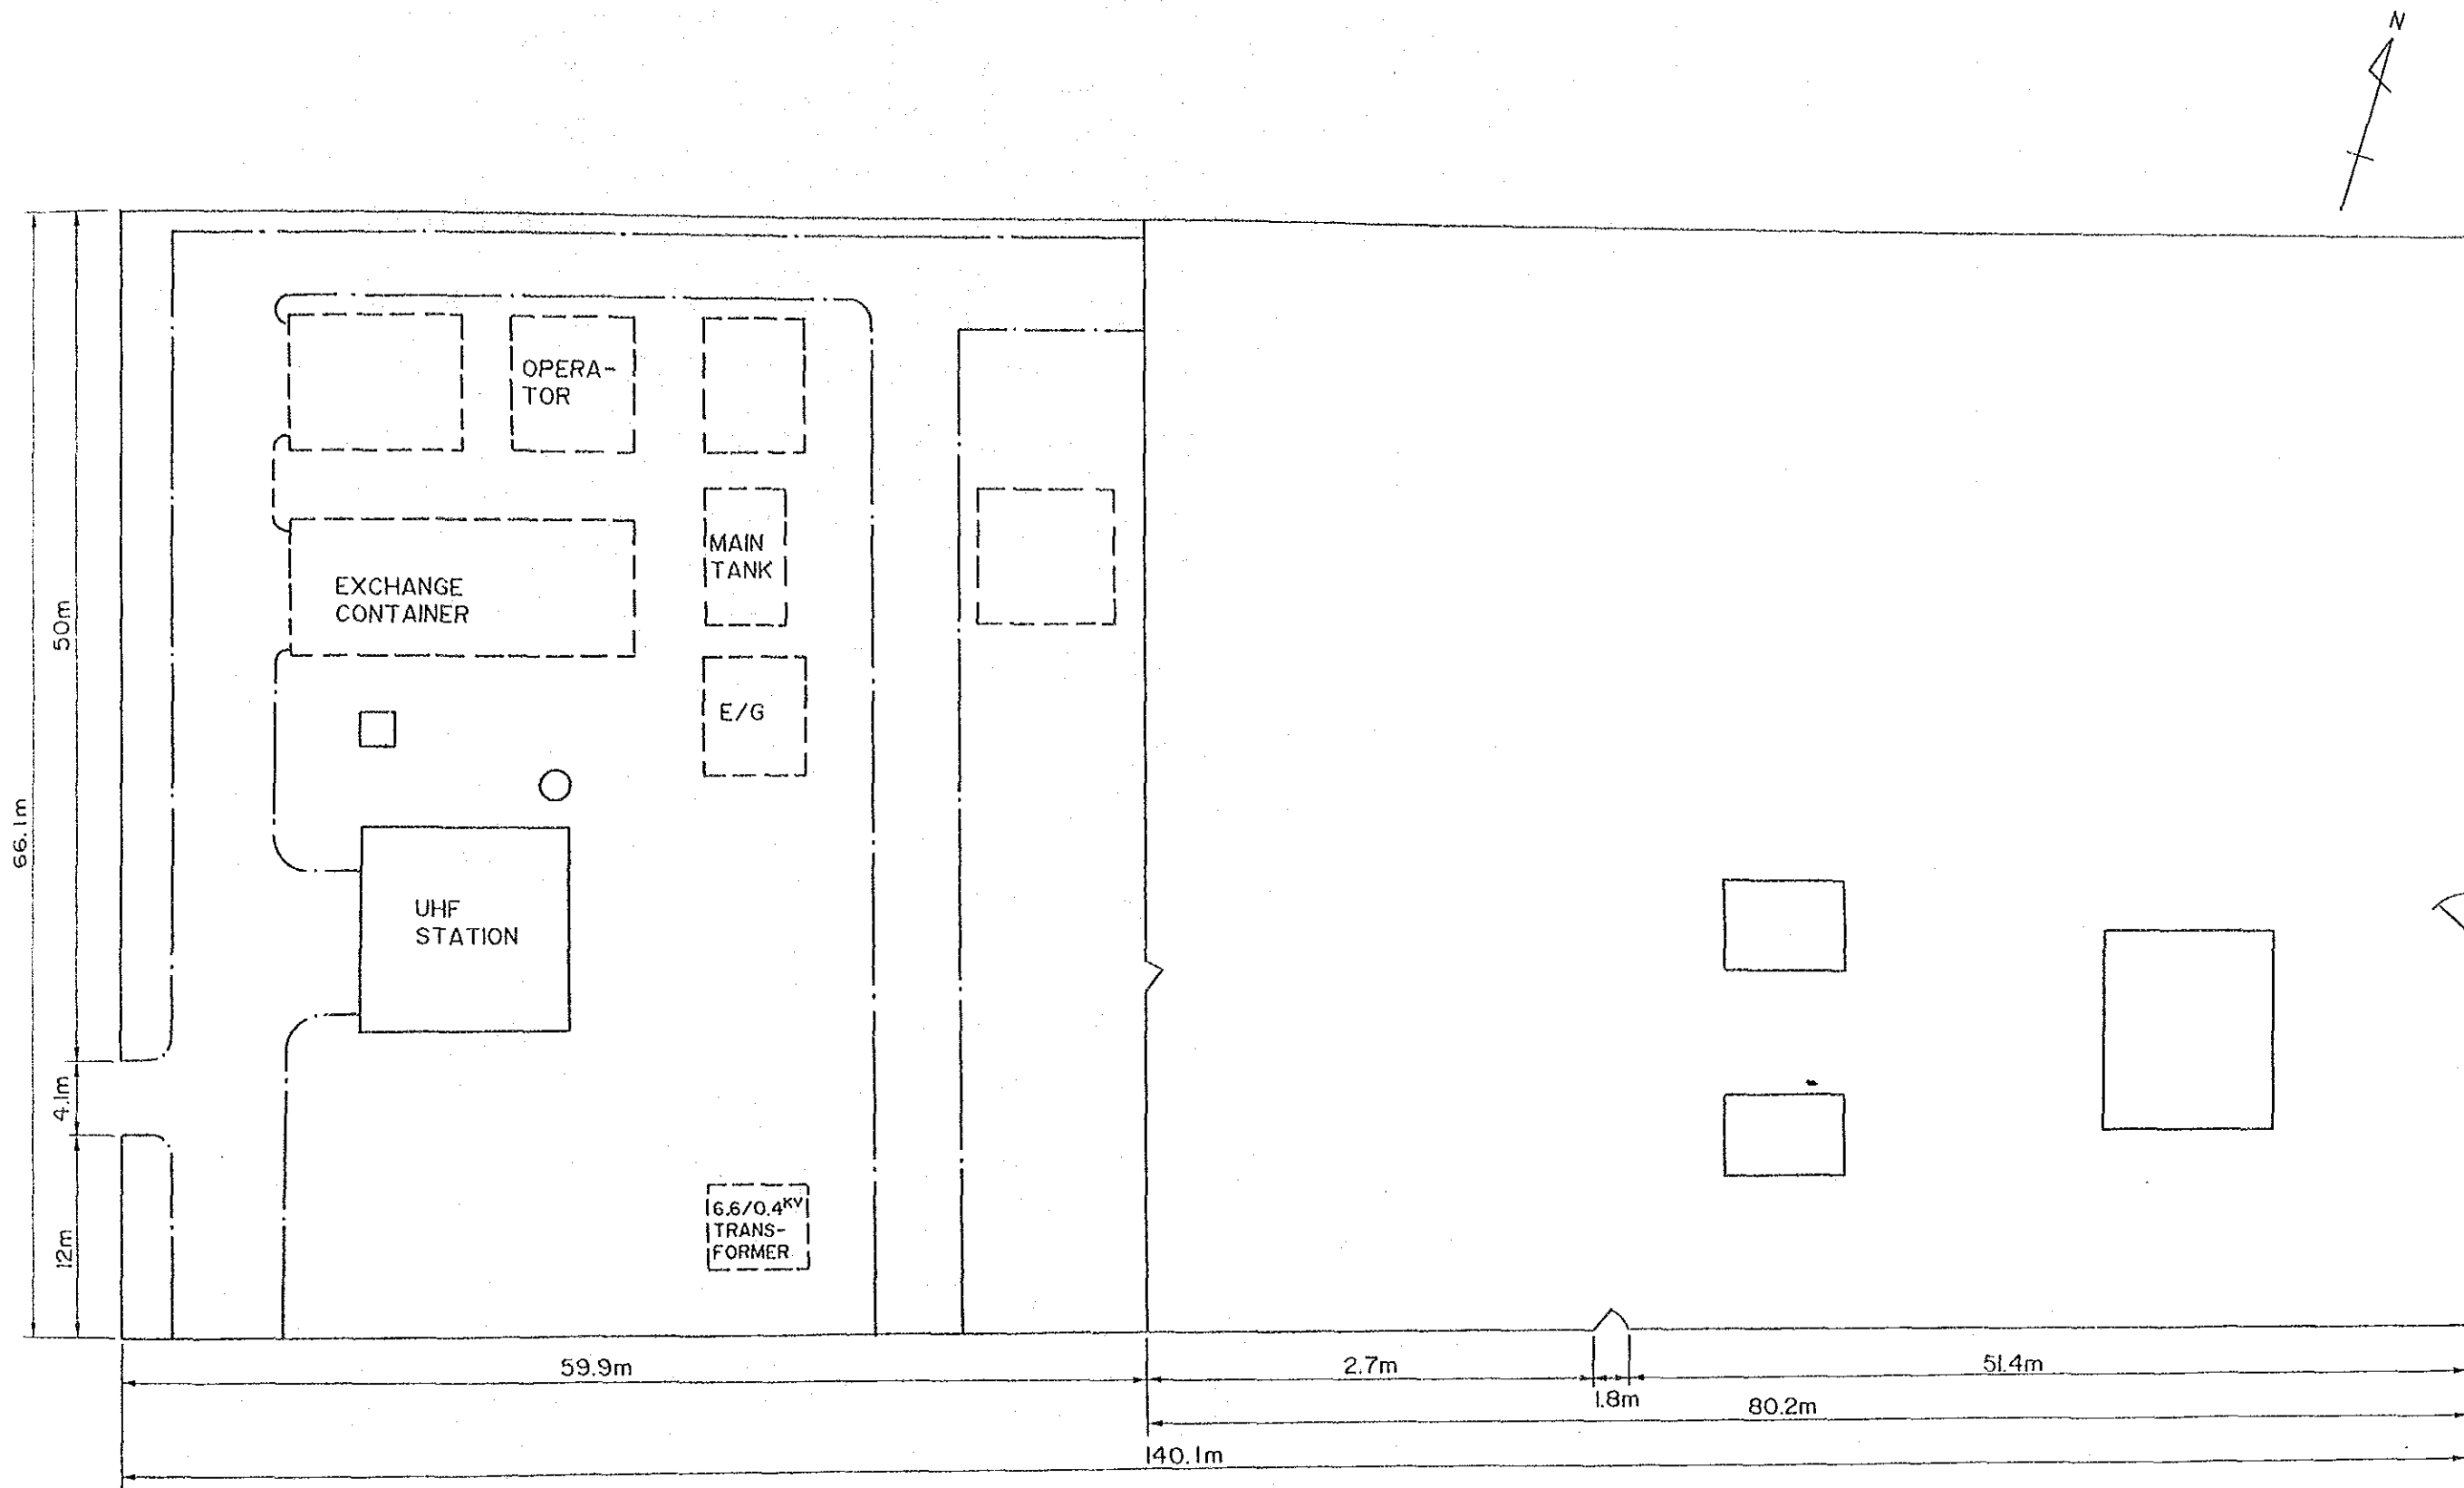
Site Layout Plan at Thayetmyo New Exchange Office
